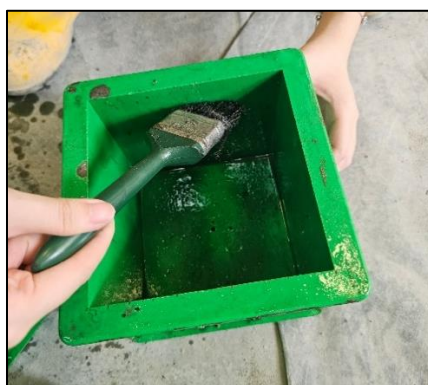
A Thin Layer of Oil Was Coated on the Mould's Surface.
